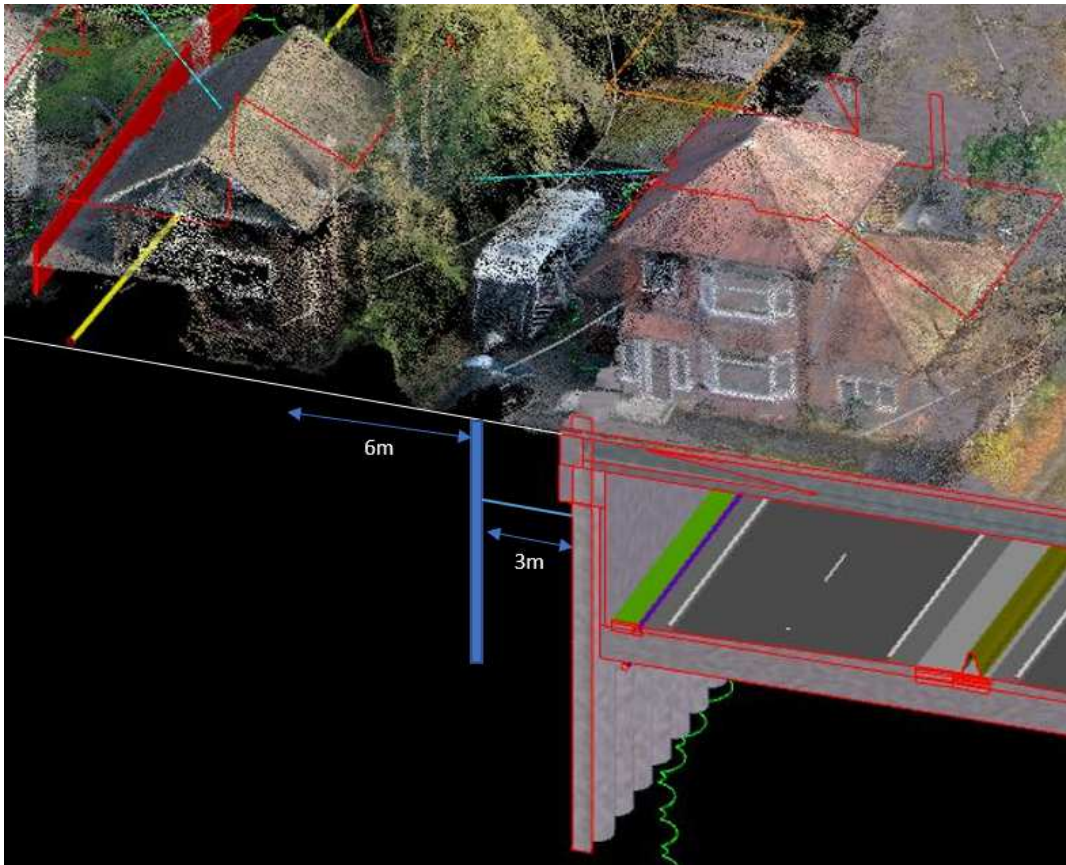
Indicative Option 3 piling arrangement at No. 21a Old Road
